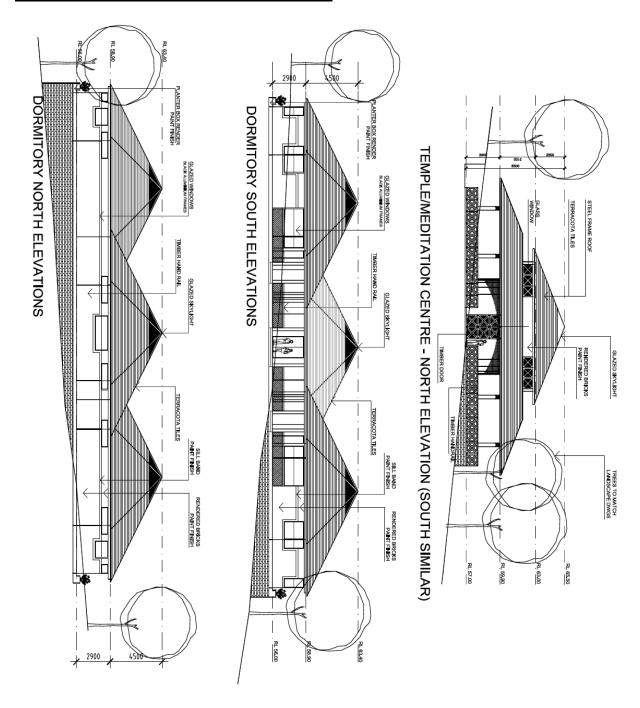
# DETAILED PLAN OF TEMPLE/MEDITATION CENTRE & DORMITORIES
